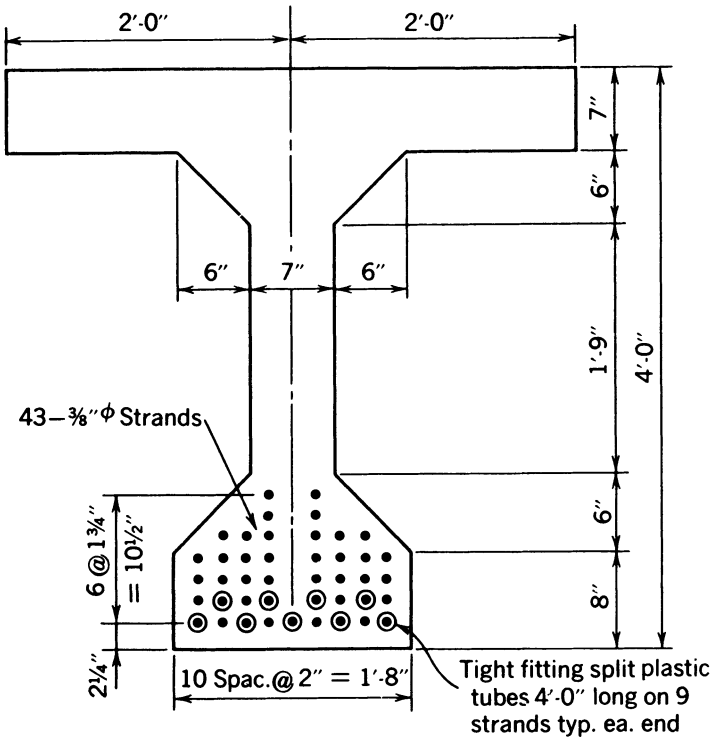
Beam section indicating method of preventing bond on prestressed tendons.
